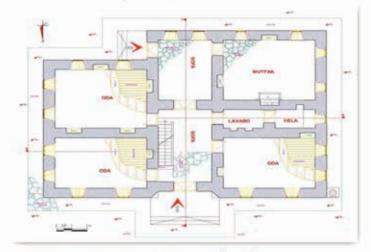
Cevdet Paşa House Ground Floor Layout (Ş. ÖZTÜRK)
